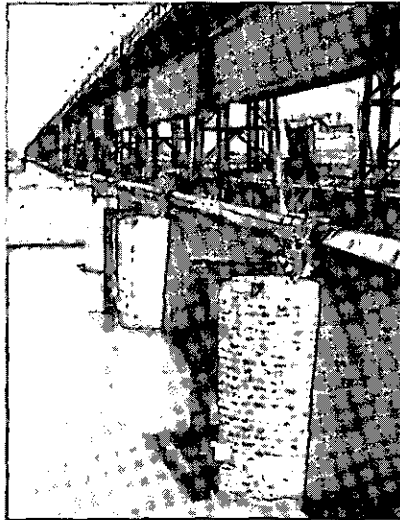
Upstream View of Barrage showing Load Transfer Fenders
